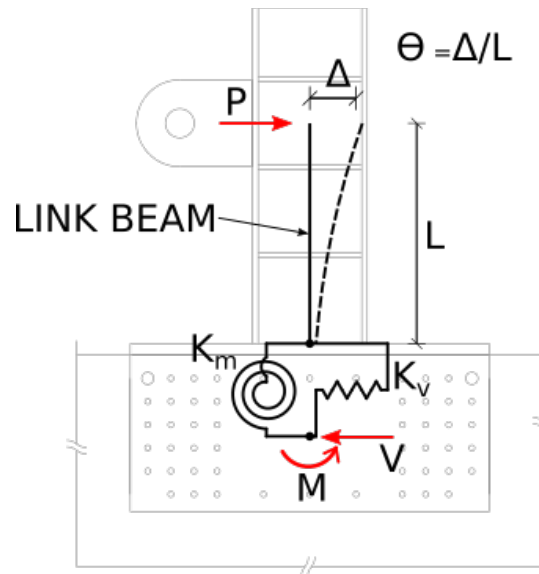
Analytical spring model of beam to wall connection and calculation of chord rotation.
